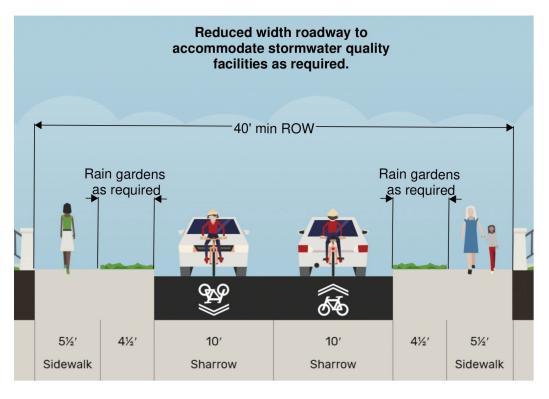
Family Friendly (Local Rural Street) at Stormwater Facilities
